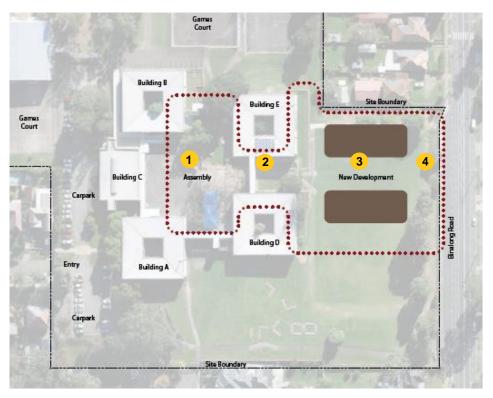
Landscape masterplan open space areas Source: Gound Ink Landscape Architects with Architectus overlay.
